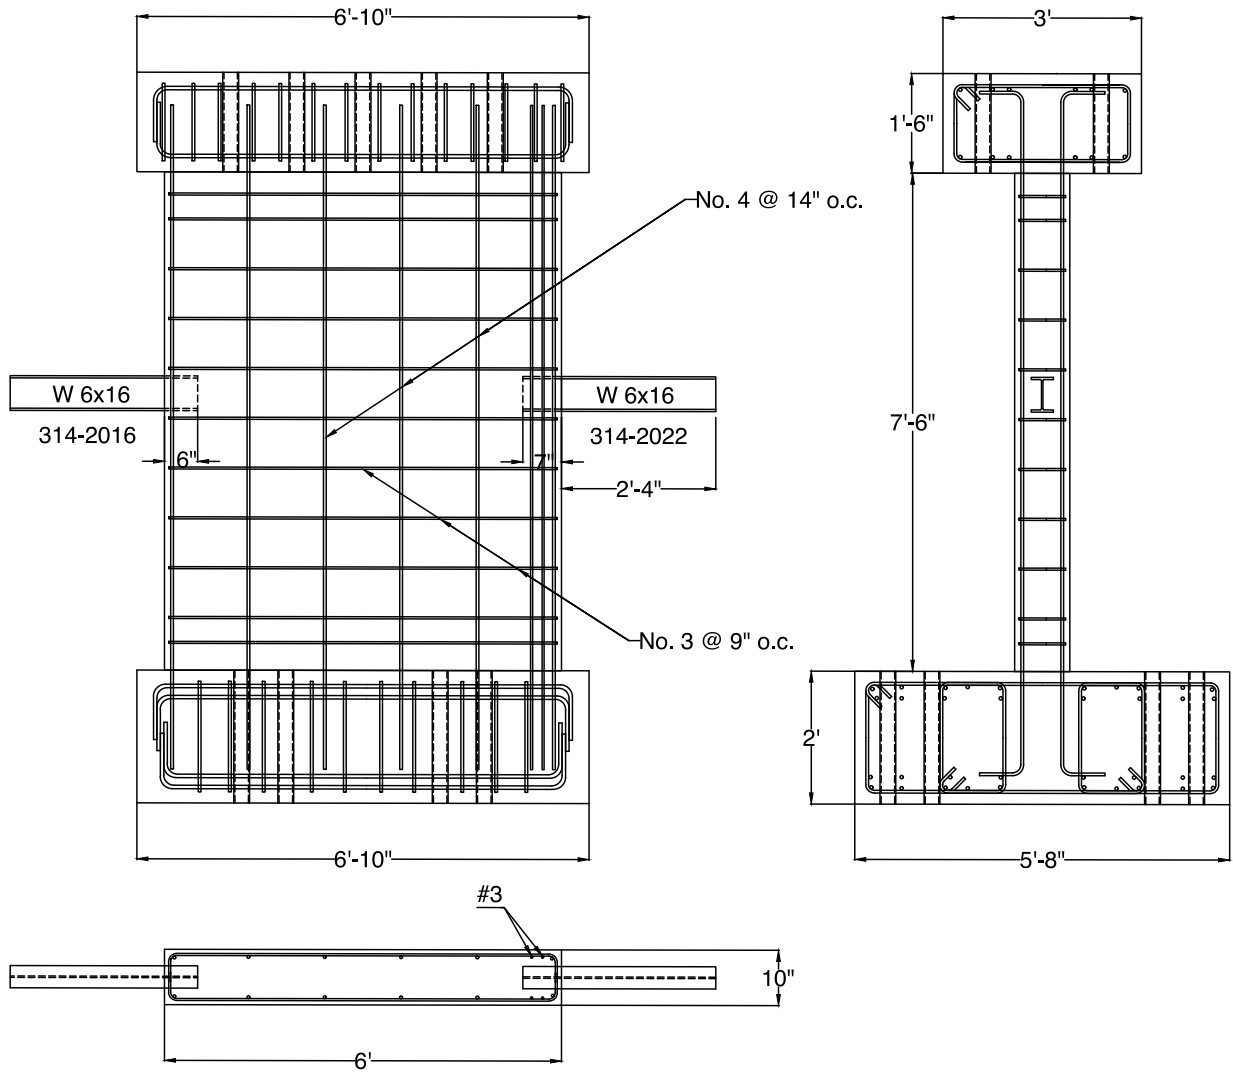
Details of specimens 1a and 1b (tests 1 and 2).
